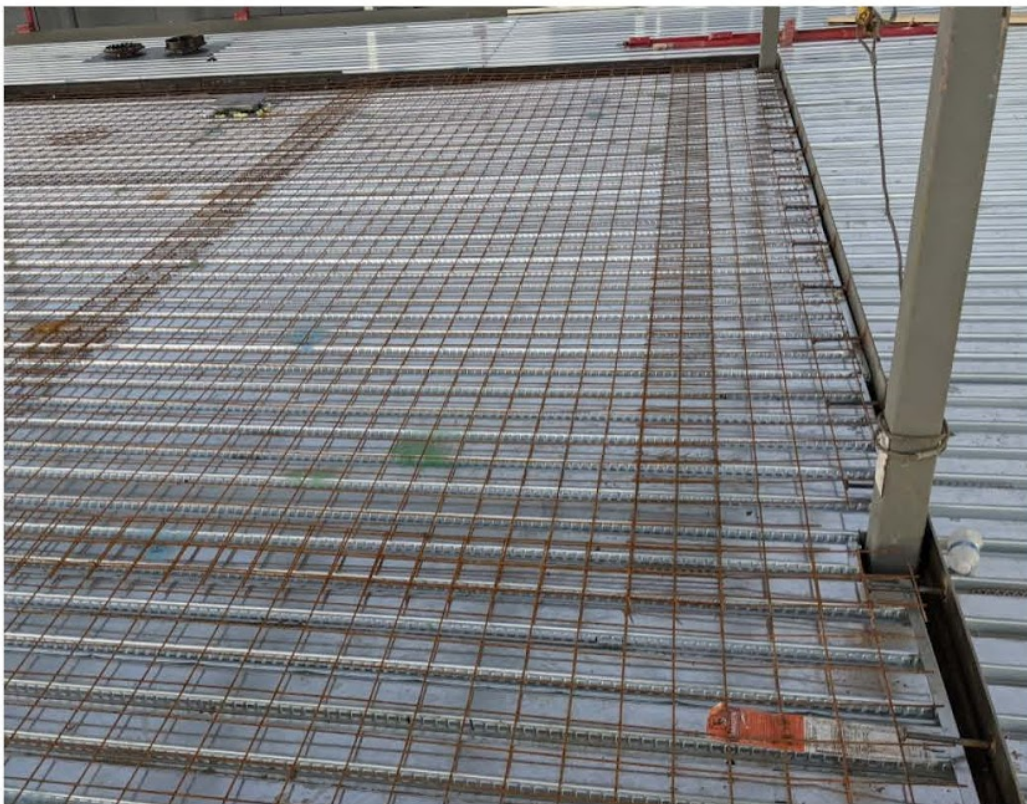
Welded wire reinforcing and slab edge angle
